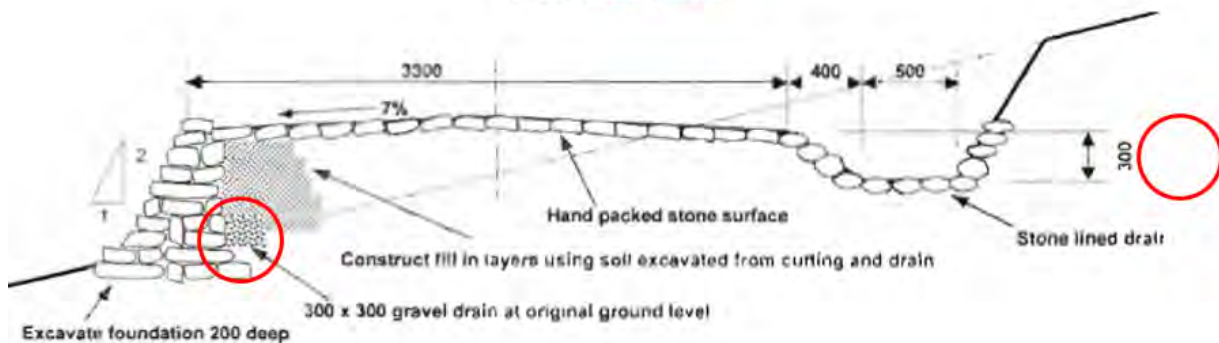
Road cross-sections showing how road design and drainage vary with slope and soil type
